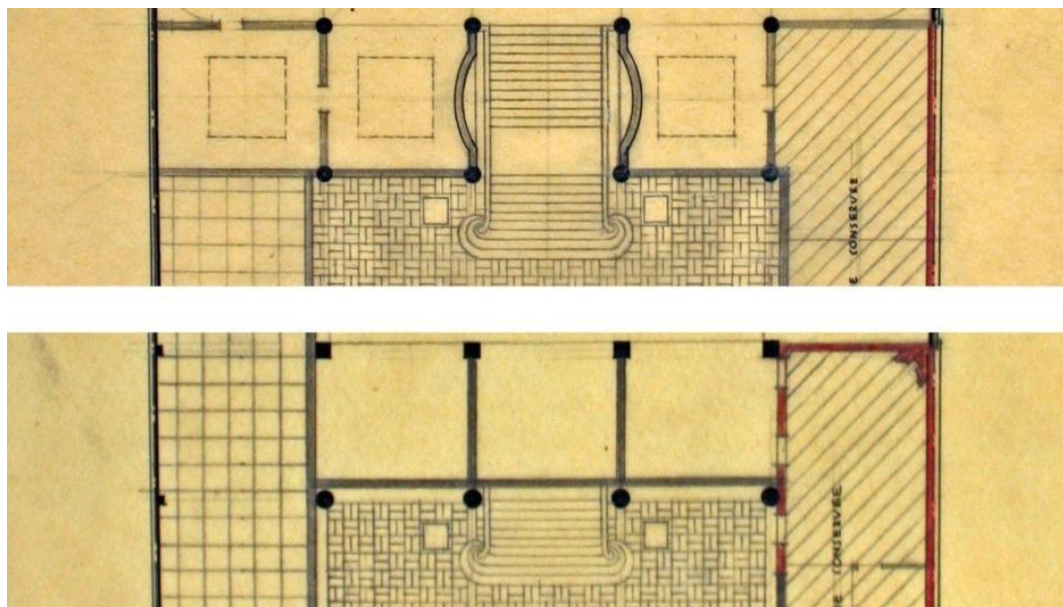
On the lower ground plan the columns sit in front of the wall (bottom image). On the upper ground plan they sit within the wall (top image). On the original internal perspective the columns sit in front of the wall. Image credit: Perret (1931)
